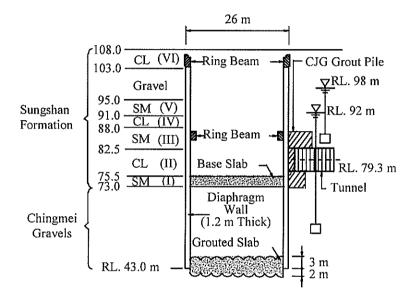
Ground conditions and configuration of the Contract CH221 ventilation shaft, TRTS
